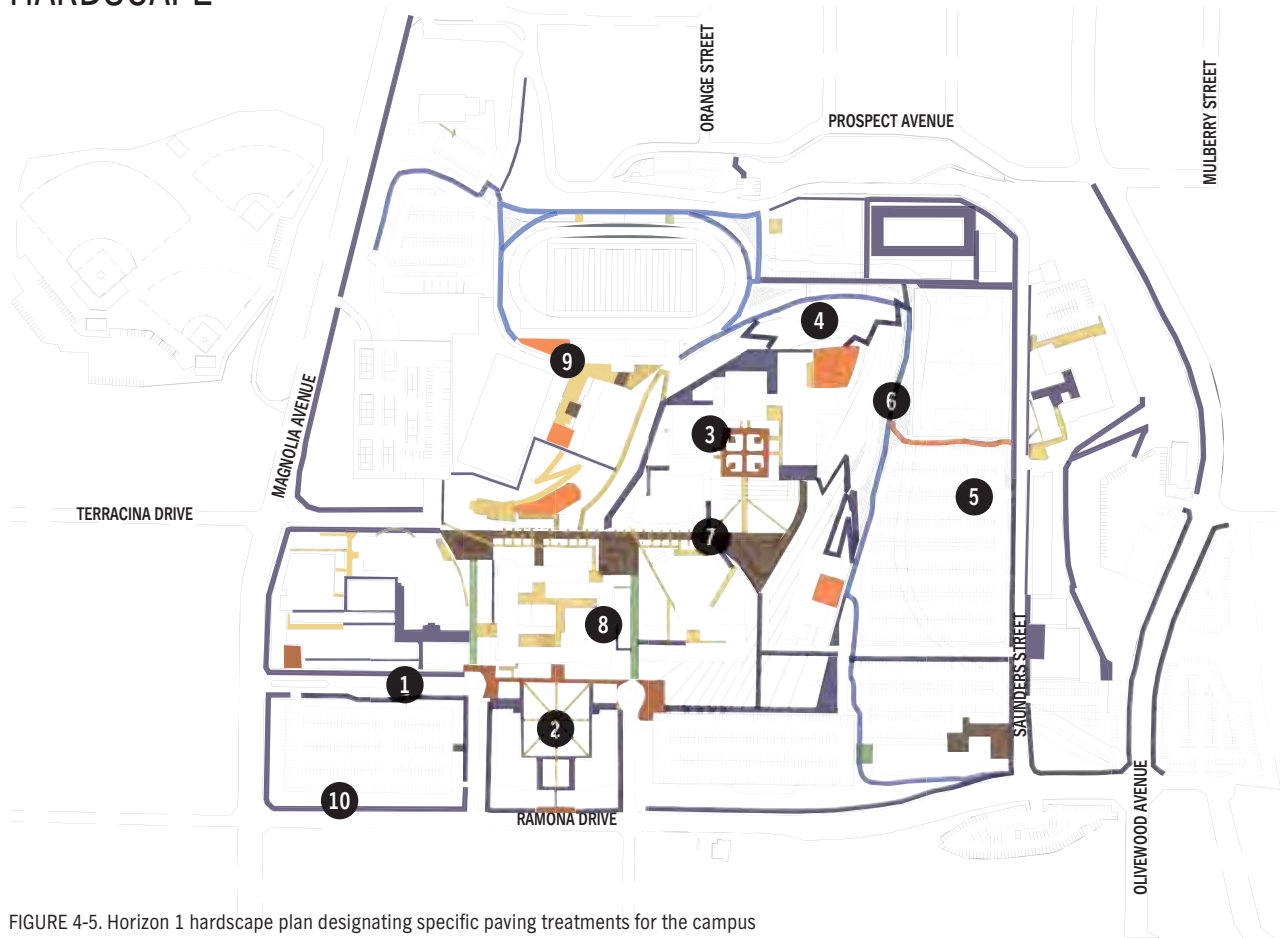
Horizon 1 hardscape plan designating specific paving treatments for the campus
